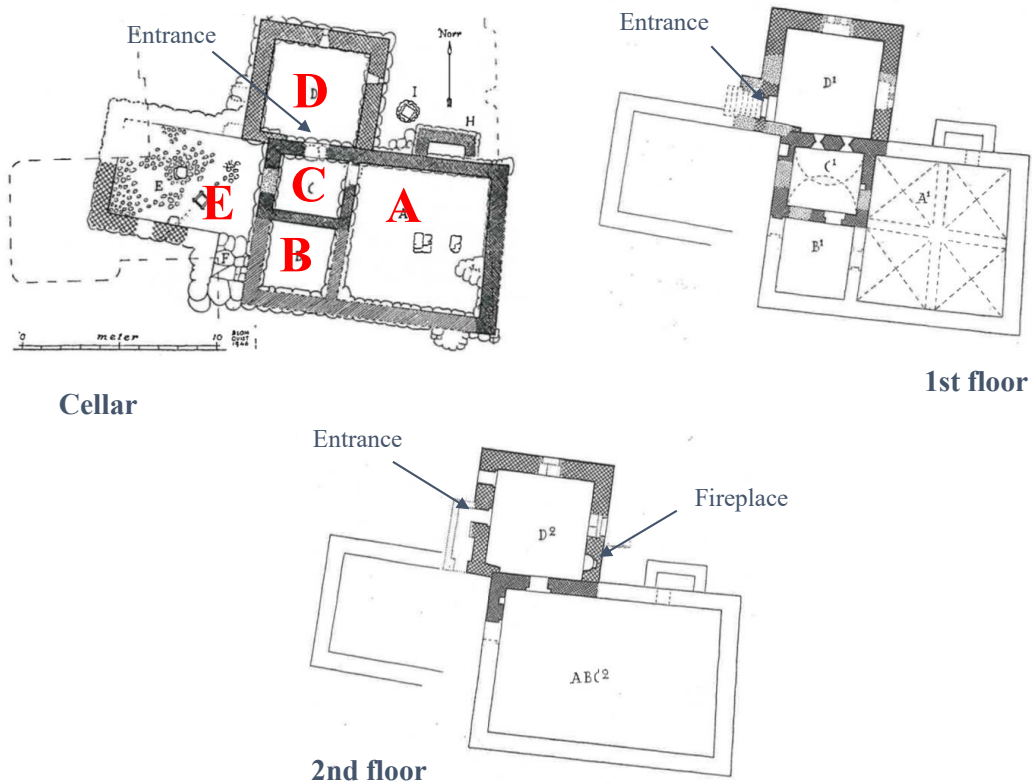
The Dean's House, reconstructed plan. (Blomqvist 1946, 72f).
